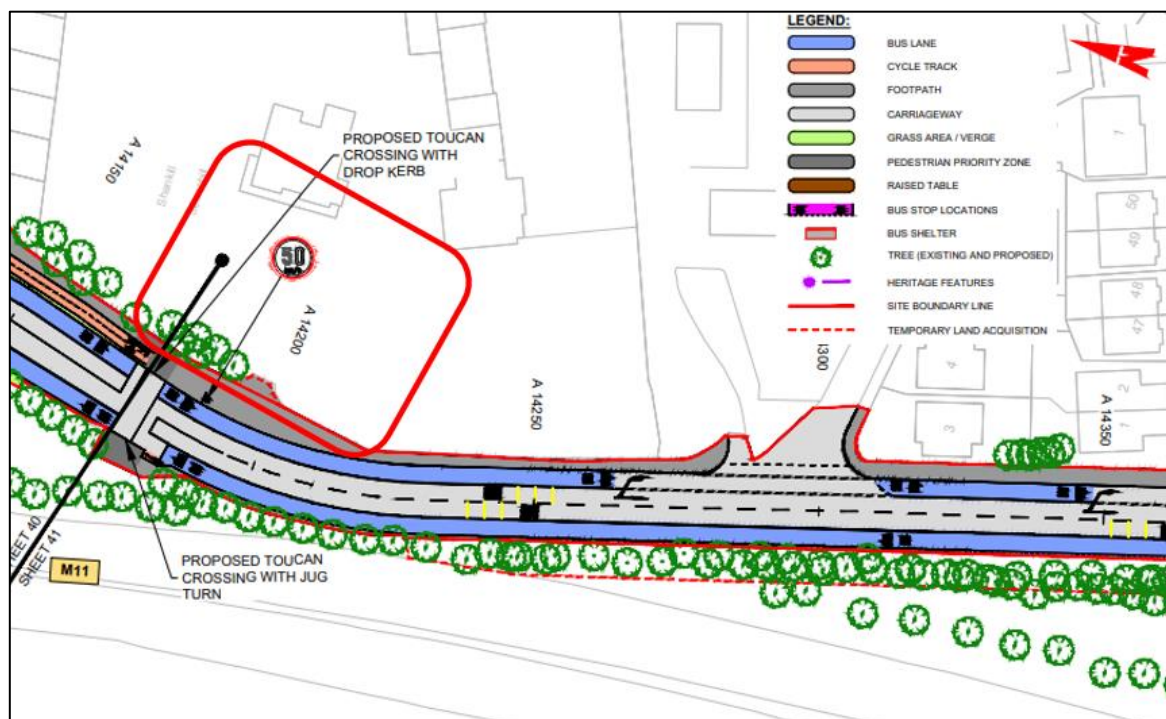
Extract from General Arrangement Drawing at Dublin Road (Sheet 41)
